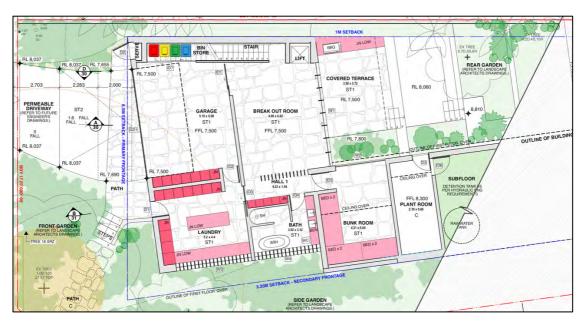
Extract of Ground Floor Plan from Architectural Drawing DA-11.
